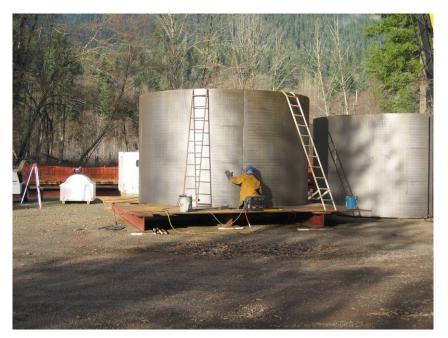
On-Site Fabrication of Bent Plate Steel Pipe
